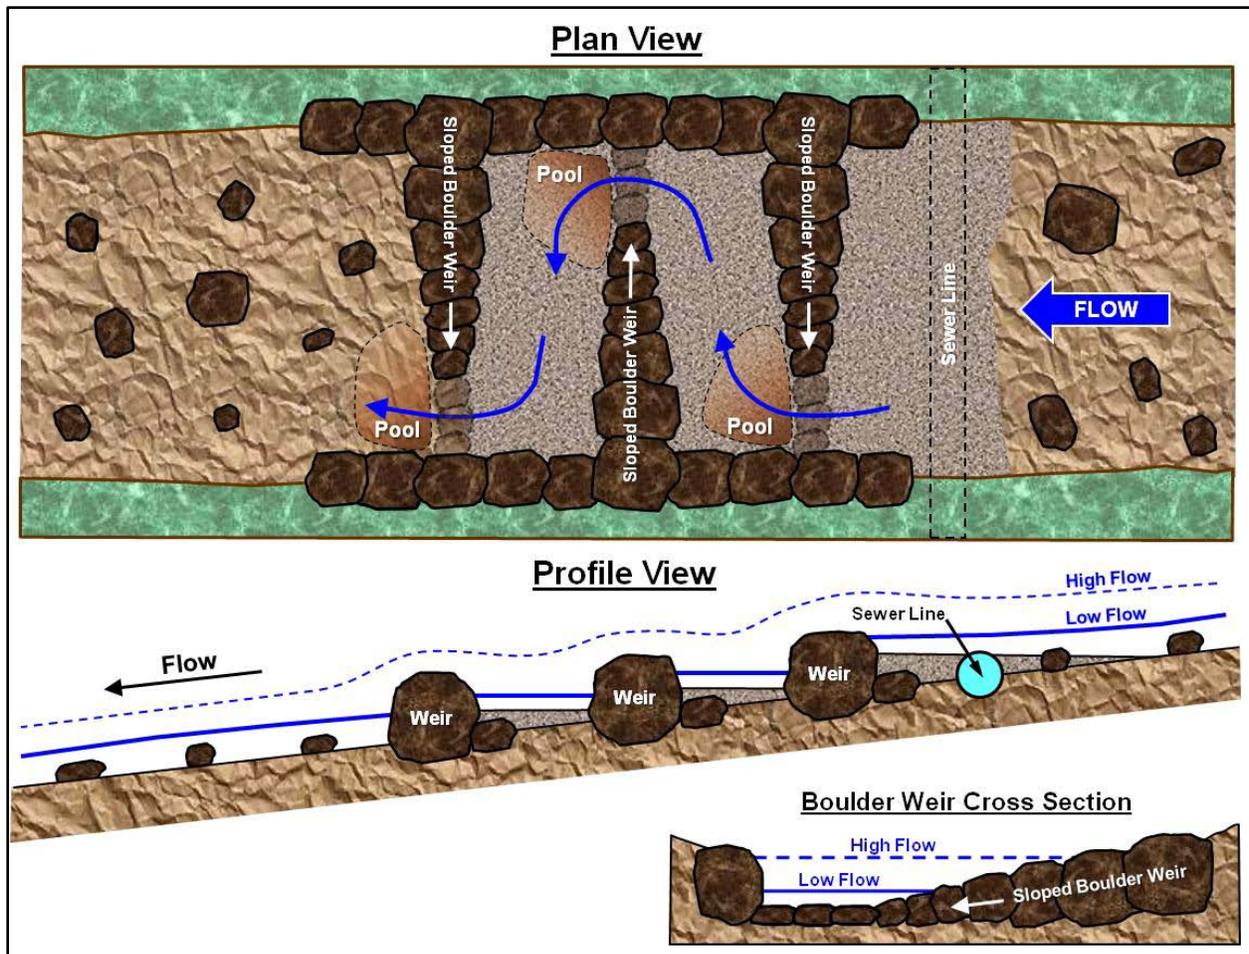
Plan, centerline profile, and cross section views of a typical grade control structure that consists of a series of boulder weirs.
